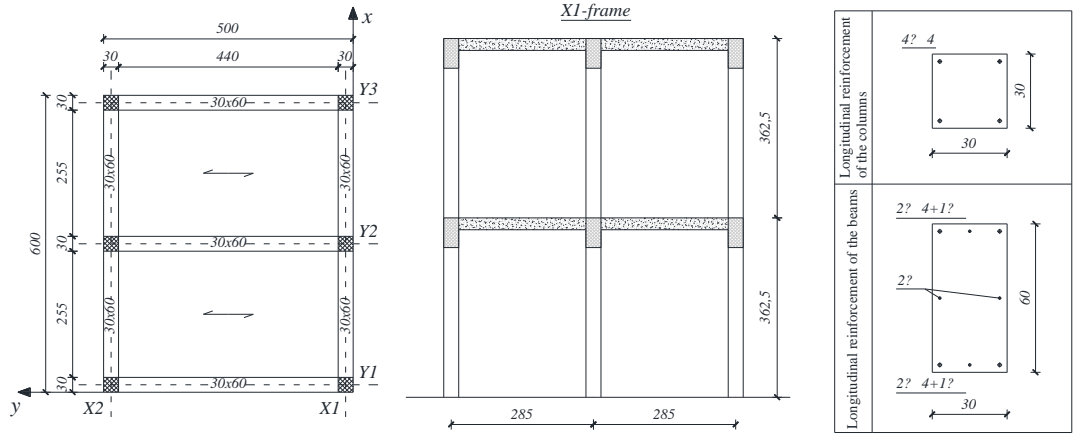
The case-study: structural plan, section and longitudinal reinforcements (units in cm)
